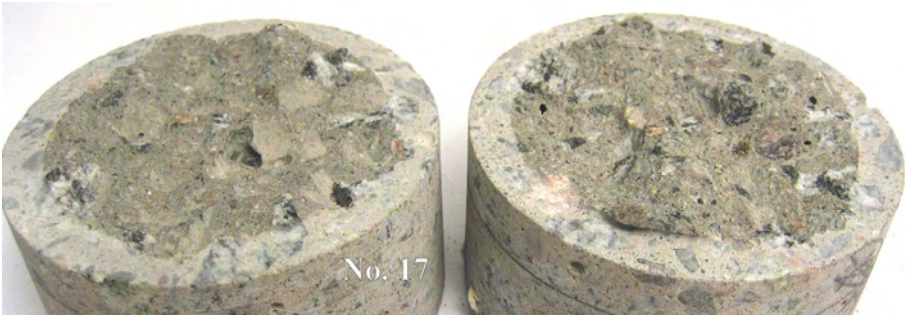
Photograph showing the failure surface for test No. 17 after fatigue test.
